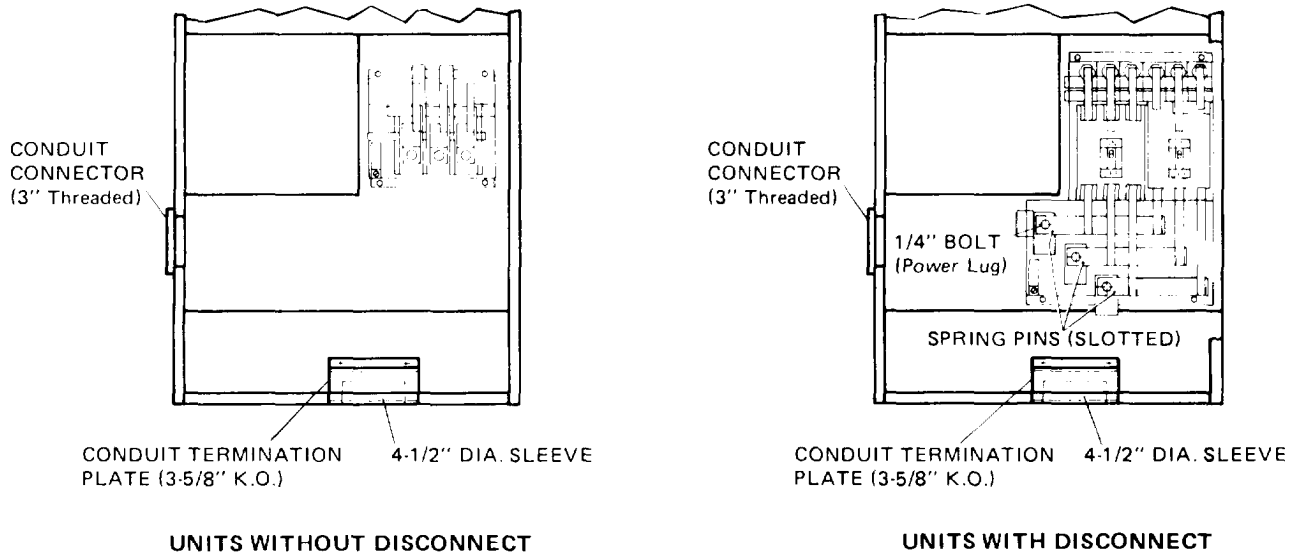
BOTTOM POWER WIRING ENTRANCE
